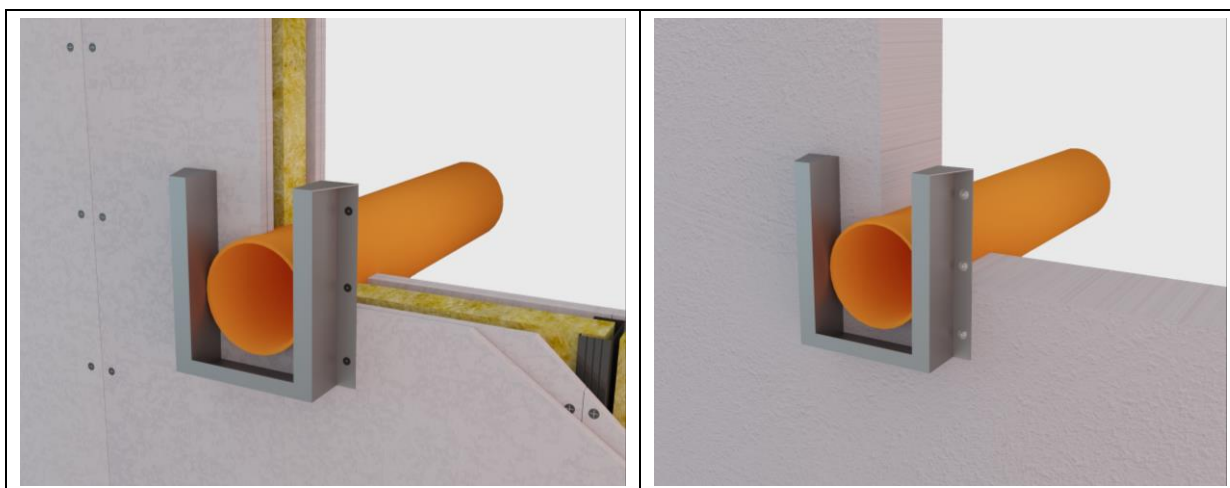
Example of plastic pipe penetration seal in a flexible or rigid wall.
